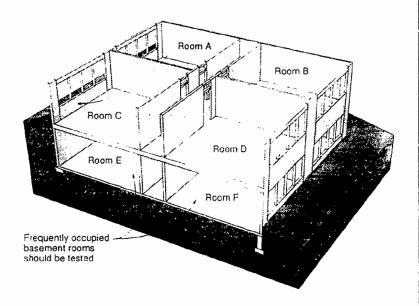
Basement—Radon measurements should be conducted in all frequently-occupied basement rooms. Some schools are built on a slope so that there are rooms in the school that are at a higher grade than the basement but have walls with some contact with the ground. Other rooms may be directly coebasement rooms and still have a wall with some ground contact. All rooms above a basement level that have at least one wall with substantial ground contact should be tested for radon.
